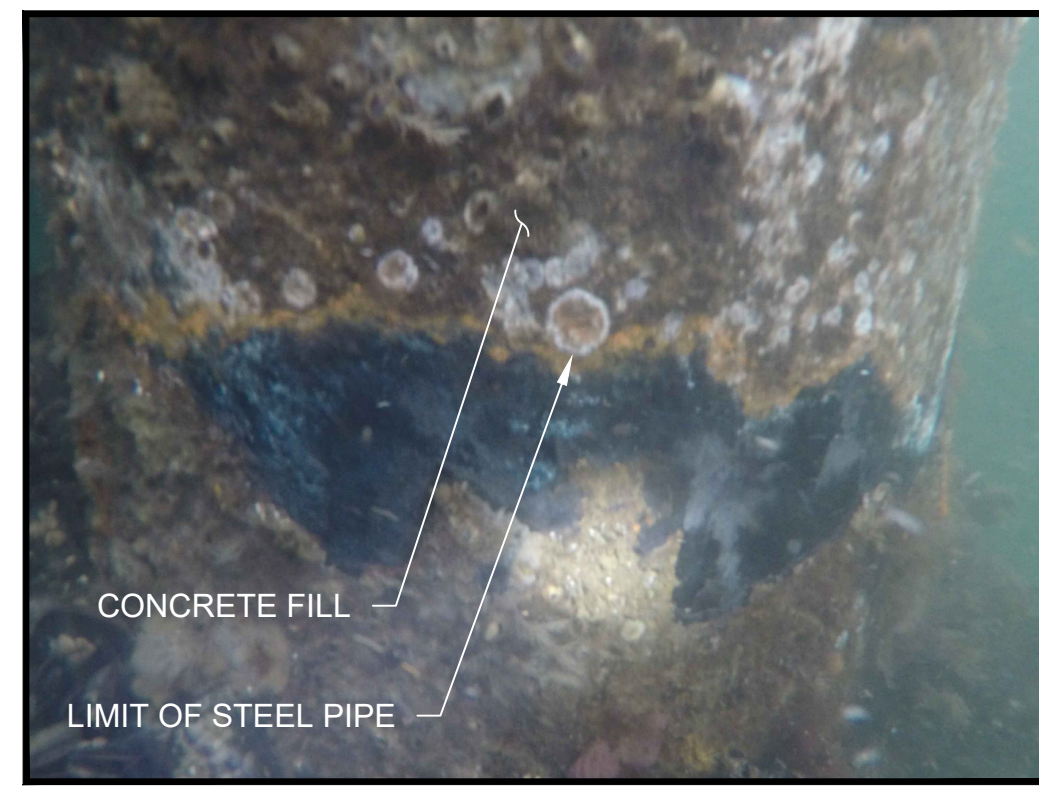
PILE CONDITIONS UNDERWATER (TYP.)
